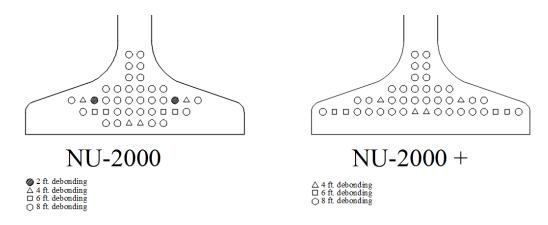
Straight Strand Pattern of NU-2000 Girder with 8-ft Spacing @ Maximum Span Length
